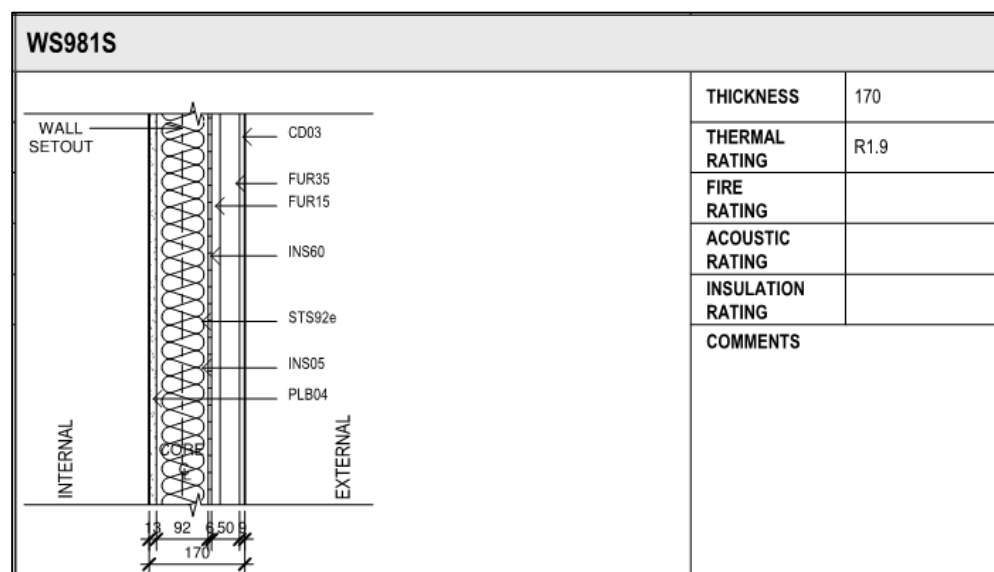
CFC Barestone CD03 : Source – Wall Type Plan M-AR-DW-8301 – Rev 6
